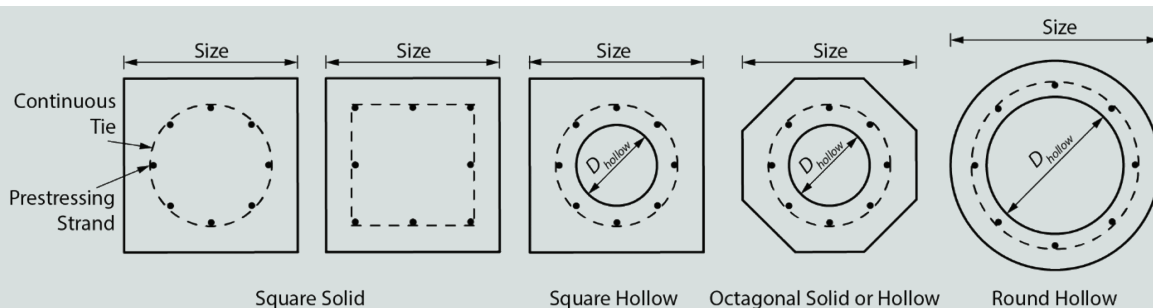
Cross sections of typical prestressed concrete piles (See Tables 3.1a and 3.1b for dimensions).
